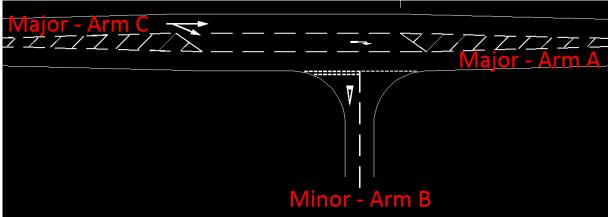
Ghost island T-junction layout (with arm labelling convention)
